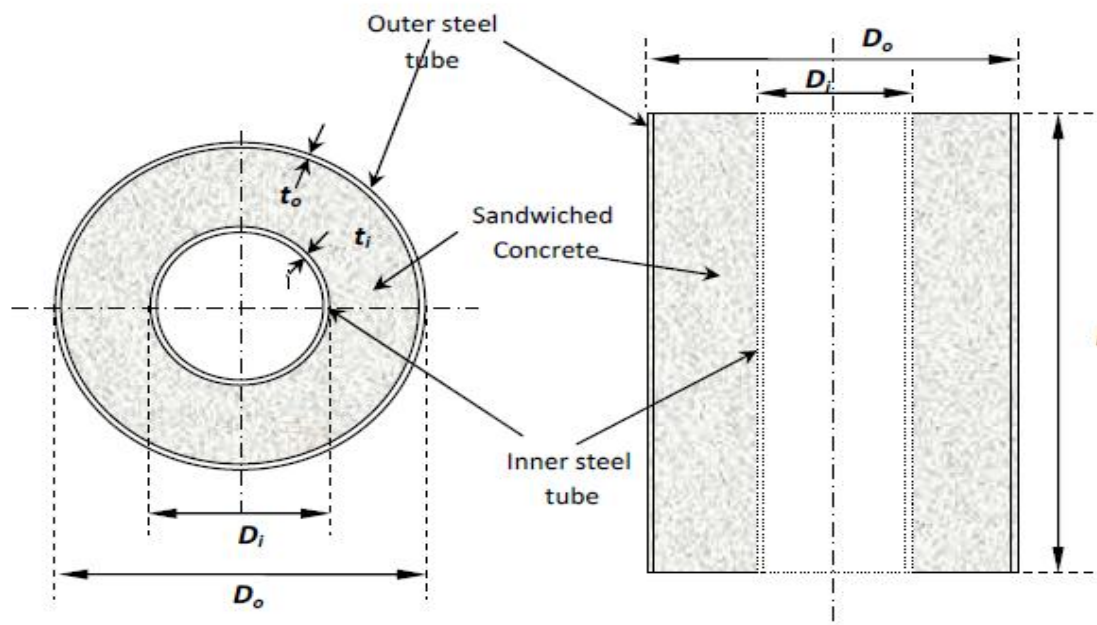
CFDSSTC columns details [14], a) cross section, b) longitudinal section.
